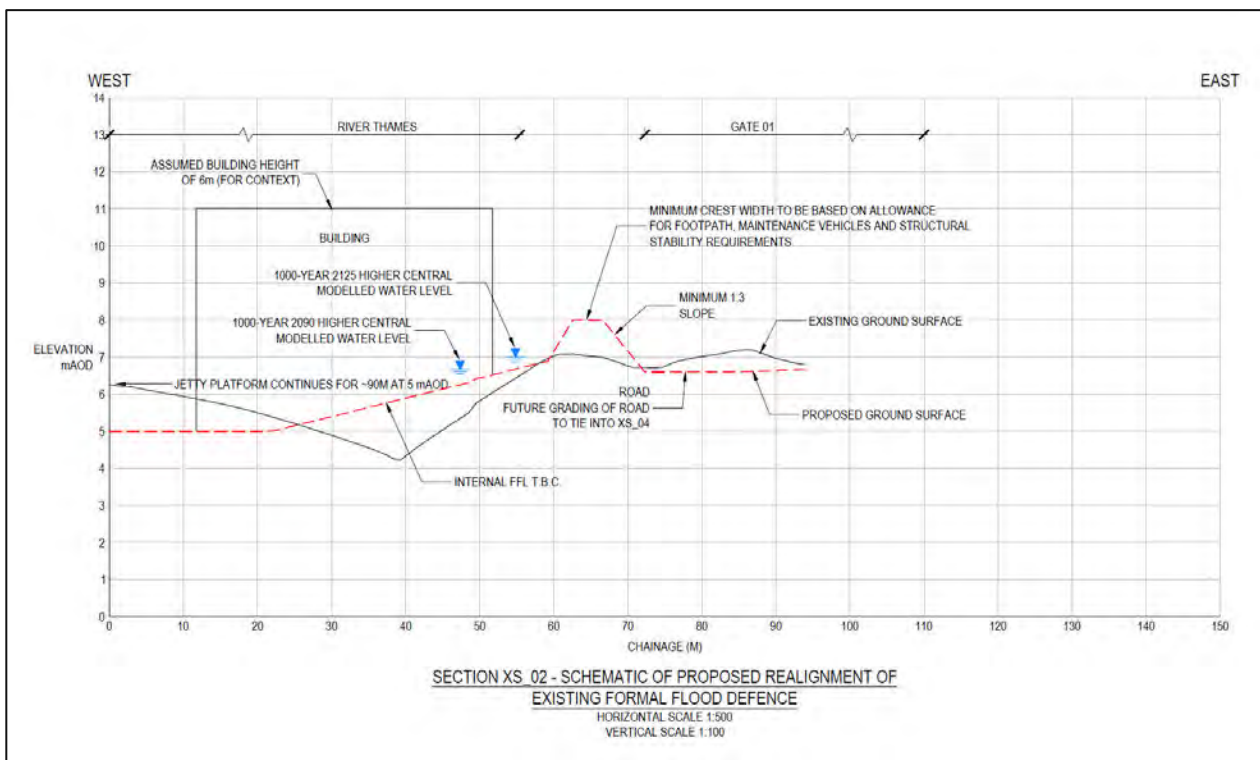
White's Jetty cross section showing the proposed initial and phased defence crest level raising, cross section location shown on the plan on Figure 4 -11.
